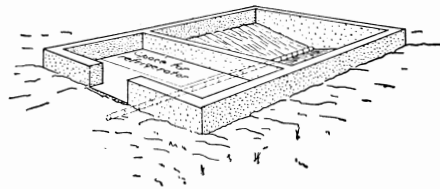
FIRST STAGE IN CONSTRUCTING THE ICE HOUSE
